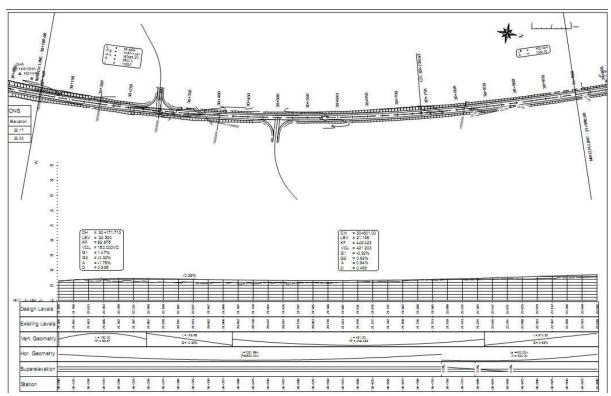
Sample Road Plan and Profile for Sections 1 and 3 Project Roads
